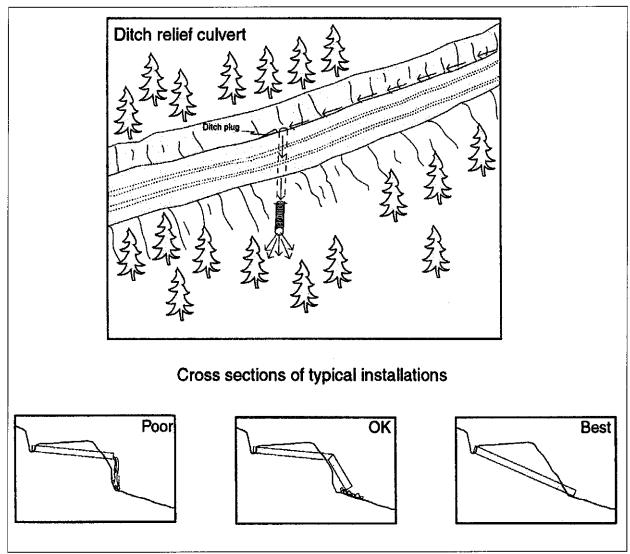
Typical ditch relief culvert installation. From CDFG (2002).
